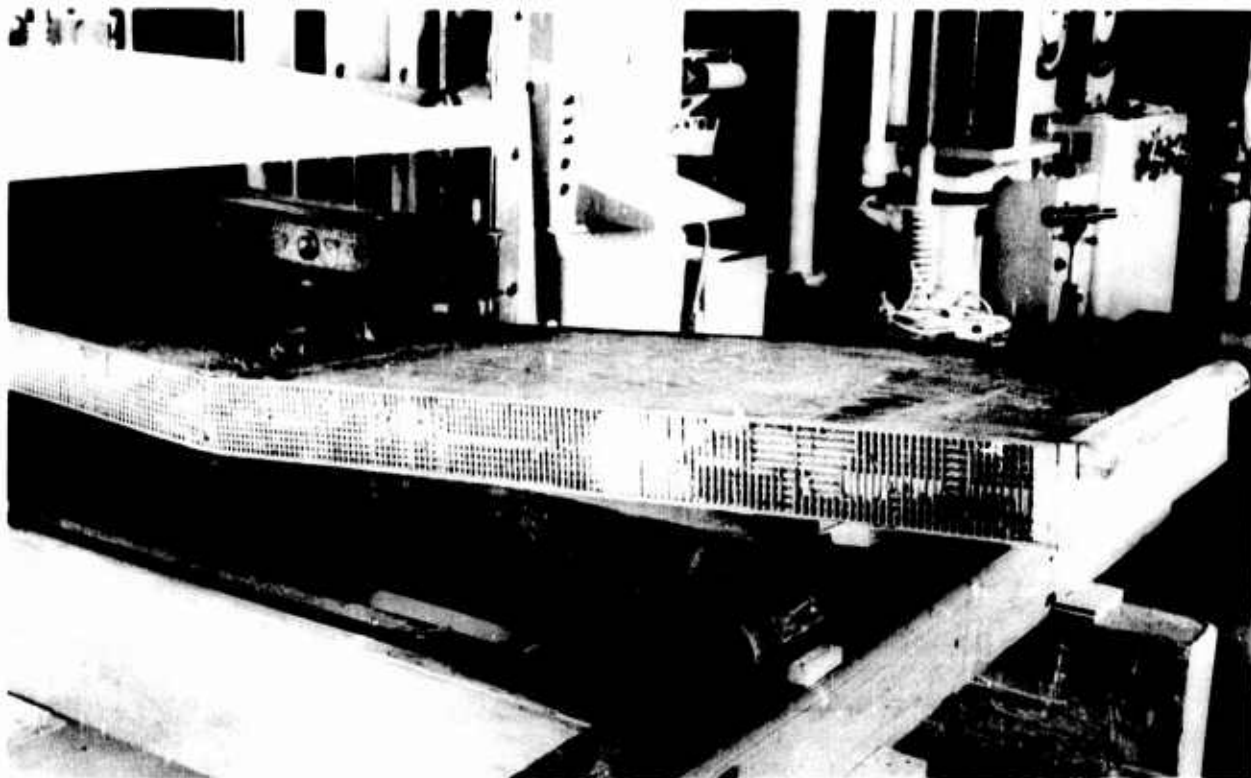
Final failure of unventilated roof panel after 21 years' exposure.
